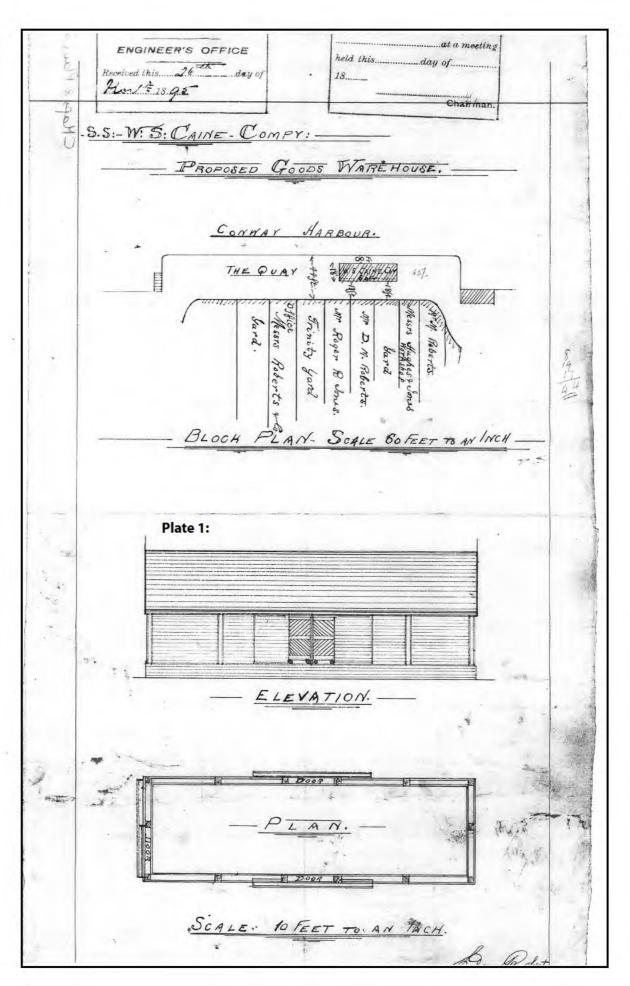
THE QUAY (PRN 19750): Building 20 (PRN 30478): Reproduction of architects' plans for a proposed goods warehouse were by the council engineer's office on the 26th of November 1895 (Conwy Archives: CMP 23/1/79). The structure was built for the W.S. Caine Company. A later plan to extend the building to the SE, was submitted on May 12th 1906. This is in the name of the M.L. & N.W.S.S. Co. Ltd. (Conwy Archives CMP 23/2/168 reproduced as plate 67). There are no visible upstanding remains of this structure.
